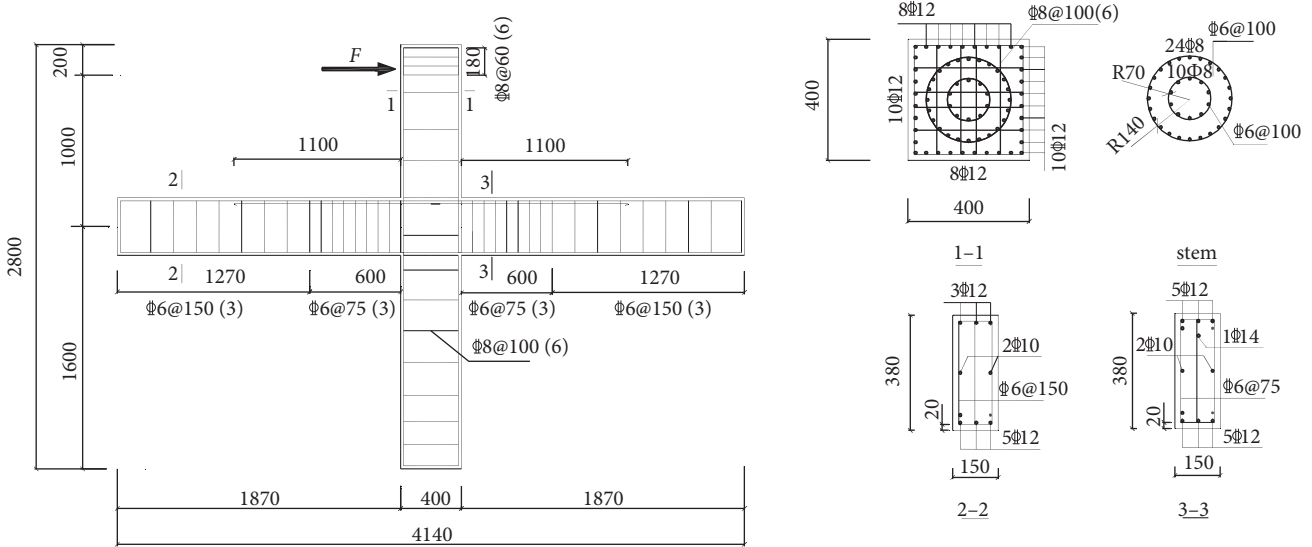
Detailed drawing of reinforcement for BCJ-3 joints.
